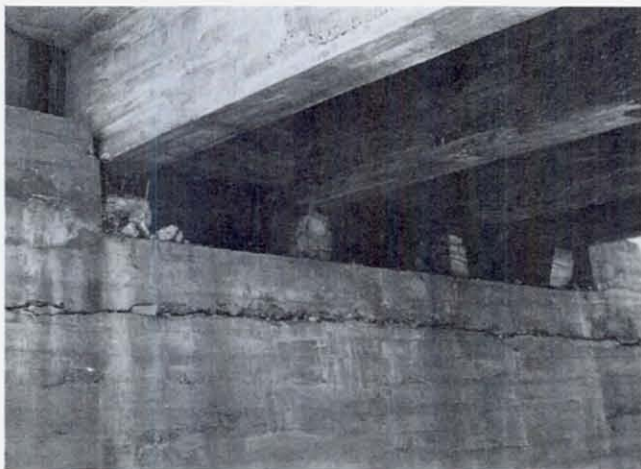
The west abutment was severely cracked, probably along a weak poor joint. The blocks under the girders, intended to provide a sliding joint, were rotated and badly disintegrated by the earthquake, almost permitting the bridge to drop unevenly on the abutments.
